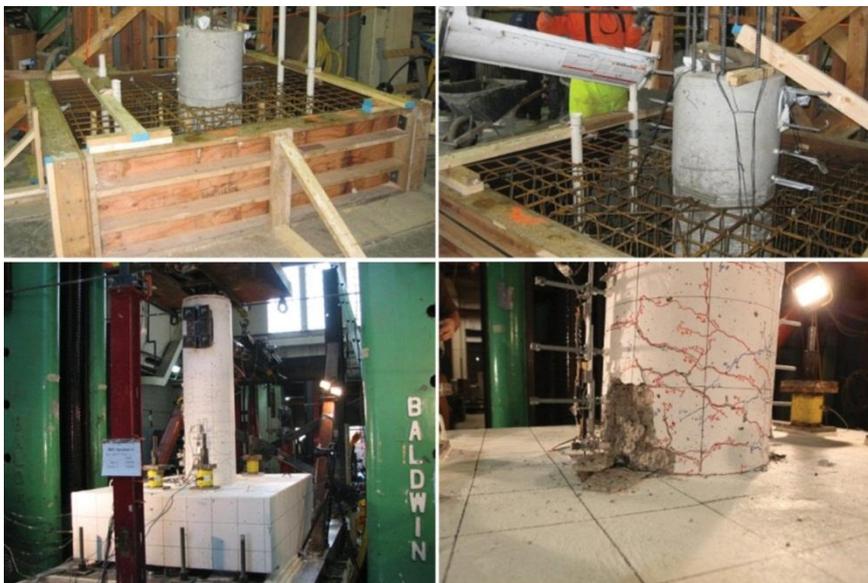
Construction and testing of precast concrete column-to-footing connection.
